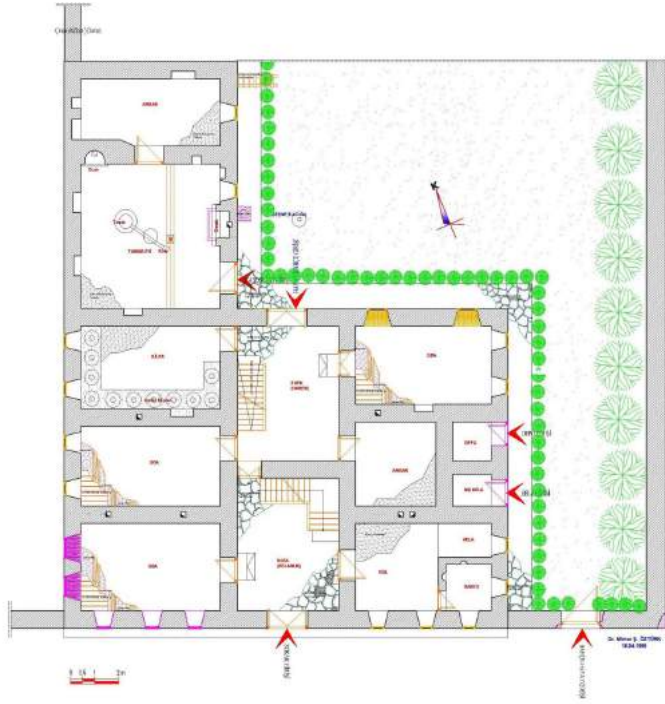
Polat Yörükoğlu House Upper Floor Restitution Plan, drawn by author.
